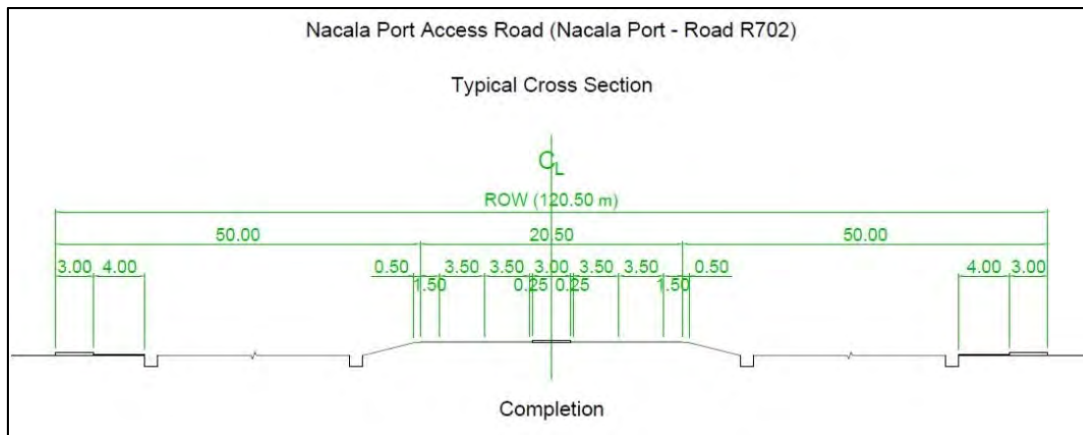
Typical Cross Section (draft/two lanes on each side, ROW = 120.5m/Nacala Port Access Road and Nampula Southern Bypass Road)
